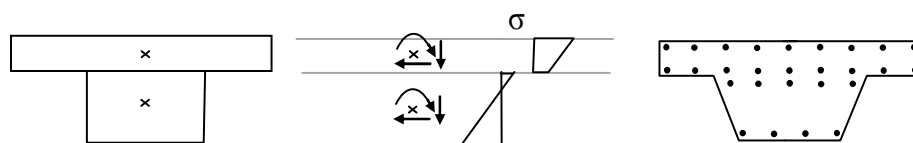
A bridge deck slab modelled with isotropic shell elements and a girder modelled with beam elements with rectangular cross-section. The reinforcement layout shows the disadvantage of modelling with isotropic shell elements.
